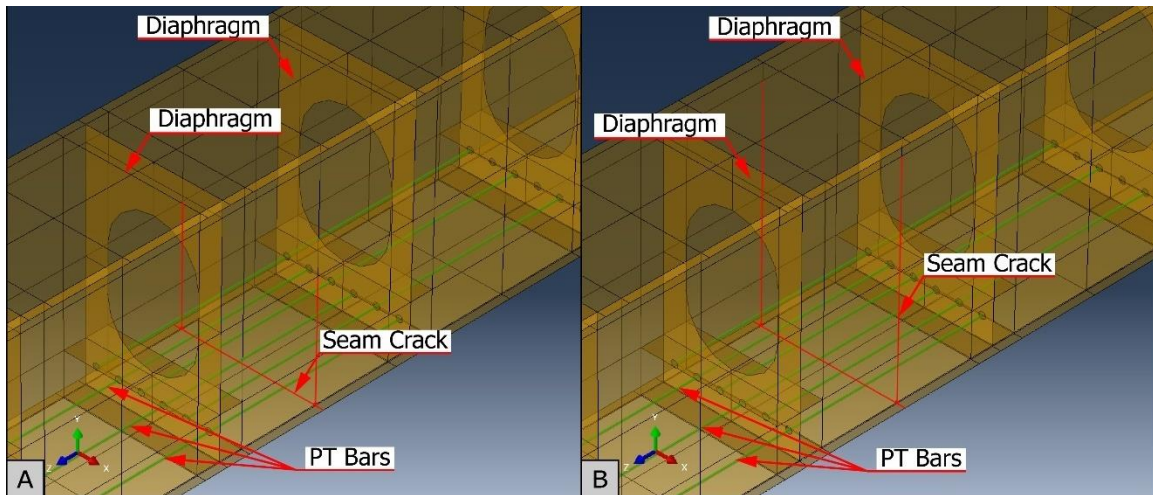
Specimen A FE model: seam crack defined on (A) bottom flange and half of the depth of both webs and (B) bottom flange and entire depth of both webs
